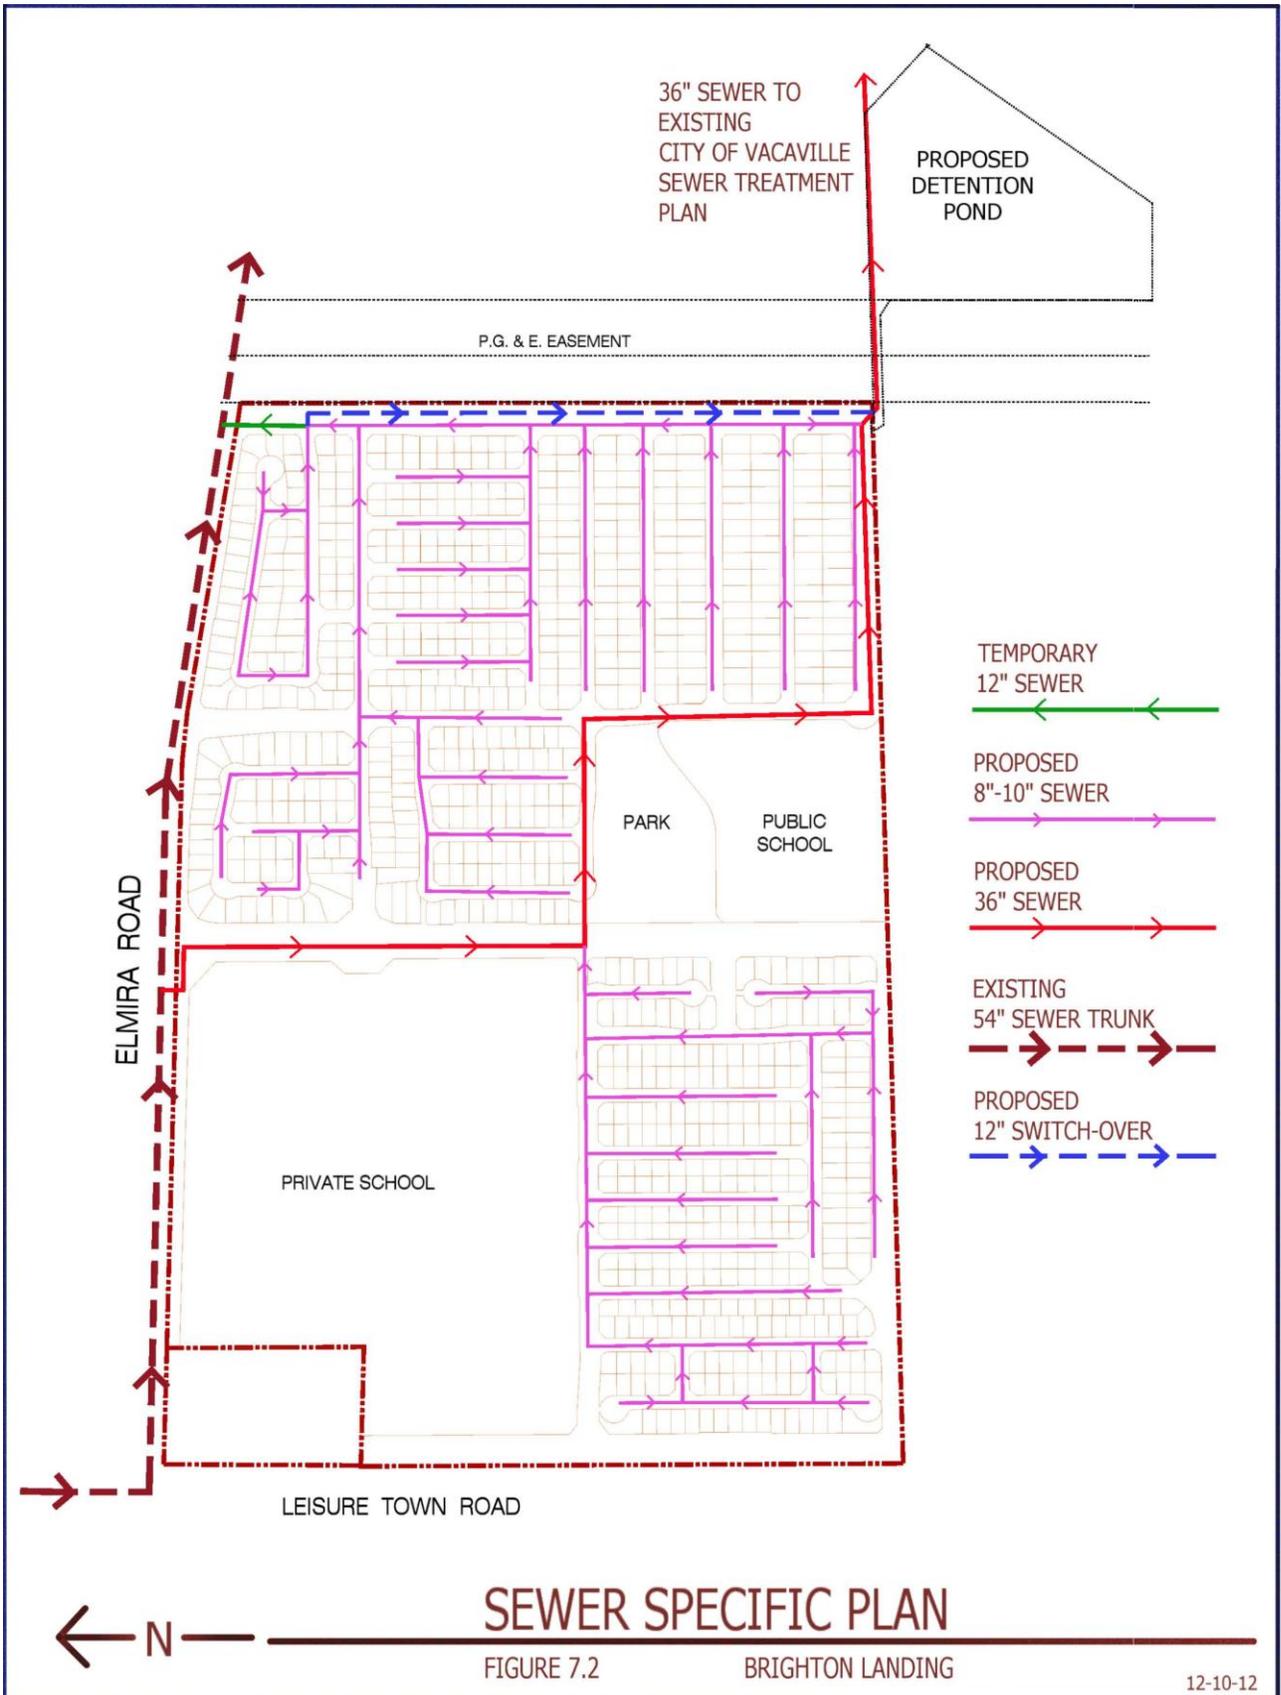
shows the Sewer Specific Plan with existing and proposed sewer line sizes. In general, all streets will have a minimum of an 8" line. It is envisioned that the Brighton Landing development will be key in developing a sewer system that will serve the entire area of future development east of Leisure Town Road. Preliminary analysis of the required sewer main line indicates that a new 36" trunk main from the Easterly Waste Water Treatment to and through Brighton Landing will be required. The depth of the sewer line is also critical to insuring that development can occur without significant importing of soil to raise the property to maintain adequate sewer cover. Beginning a new sewer system at the treatment plant allows for that design. A Sanitary Sewer Study will be required for the area that will include the size, location, phasing, etc of the sanitary sewer system. The construction of the various phases of the Brighton Landing project will comply with the findings/requirements of this study.
